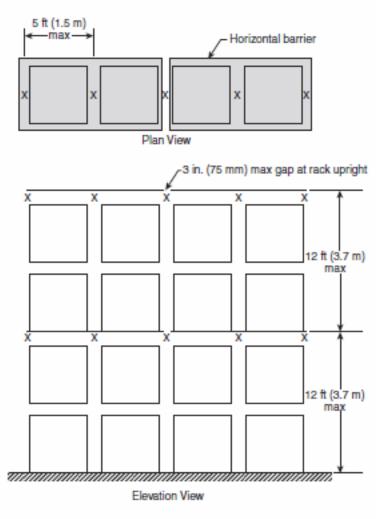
(A) Alternative Protection for Single-Row Racks.
